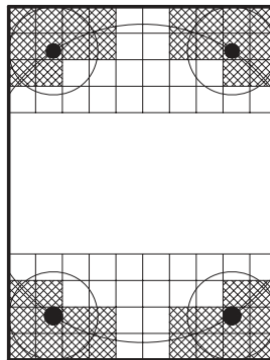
Damaged elements of concrete (Biondini and Vergani, 2014)
